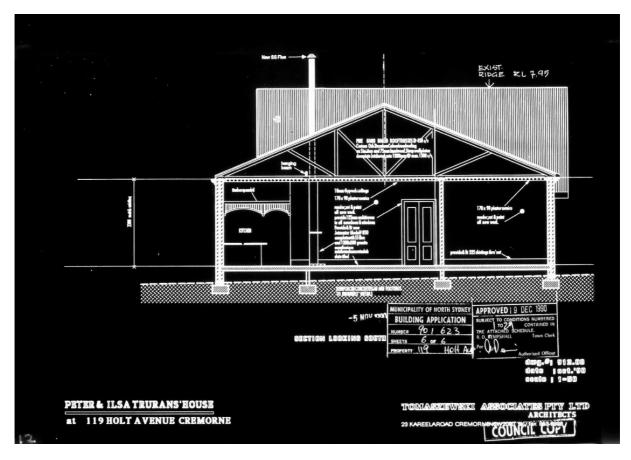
Section looking north—north and south elevations, Peter and Ilsa Truran's house, 119 Holt Avenue / Tomazsweki Associates Pty Ltd, October 1990. (Source: North Sydney Council, BA623/90)
